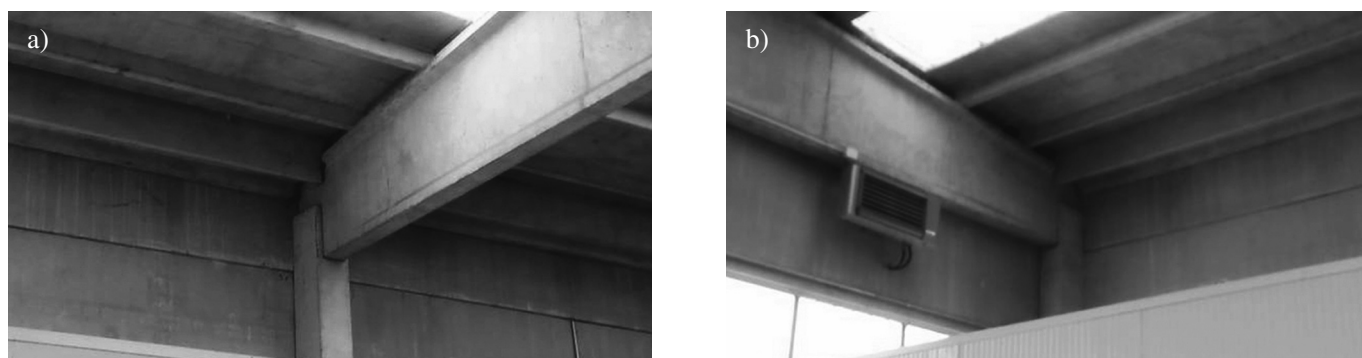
Undamaged structure: a) covering structure to beam connection; b) corner configuration.
